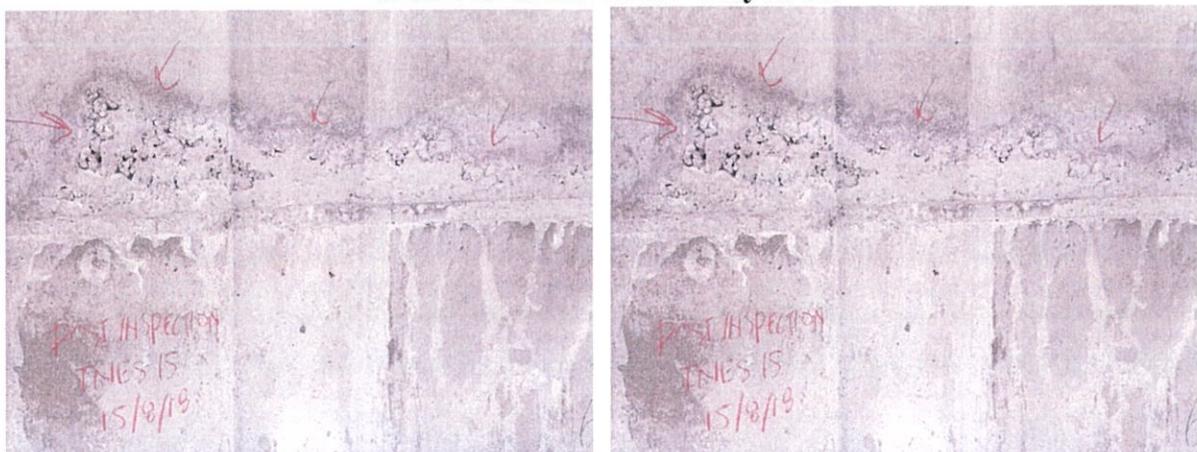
NCR-00680 was issued on 20th August 2018 about a localized honeycomb pier at the third lift construction joint and just above the pile cap.
